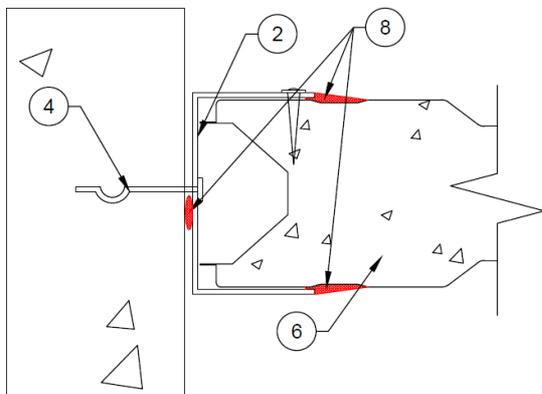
Female Panel End Detail for Vertical Speedpanel Wall
